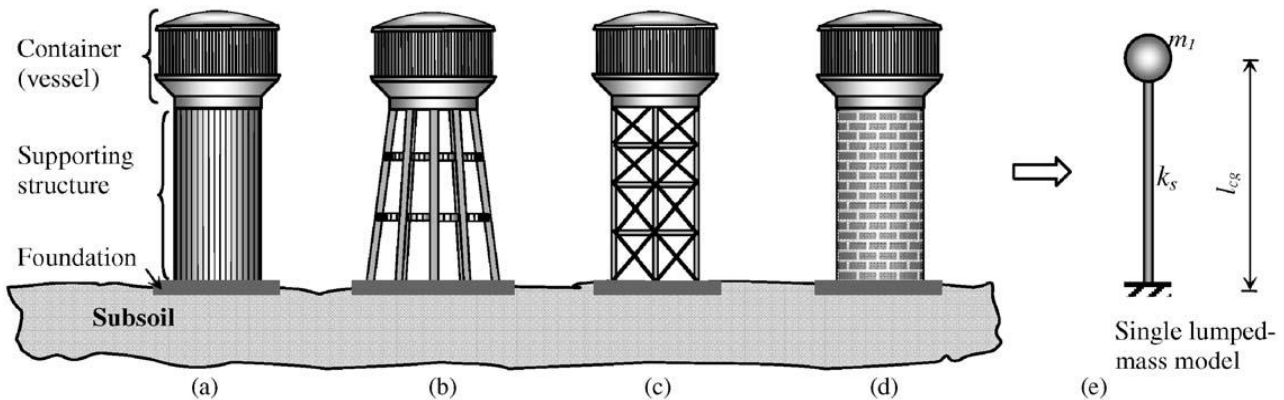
Elevated tanks and the single lumped-mass model: (a) the tank with reinforced concrete shaft supporting structure, (b) the tank with reinforced concrete frame supporting structure, (c) the tank with reinforced concrete frame with diagonal braces or steel frame supporting structure, (d) the tank with masonry pedestal supporting structure, (e) single lumped-mass model.
